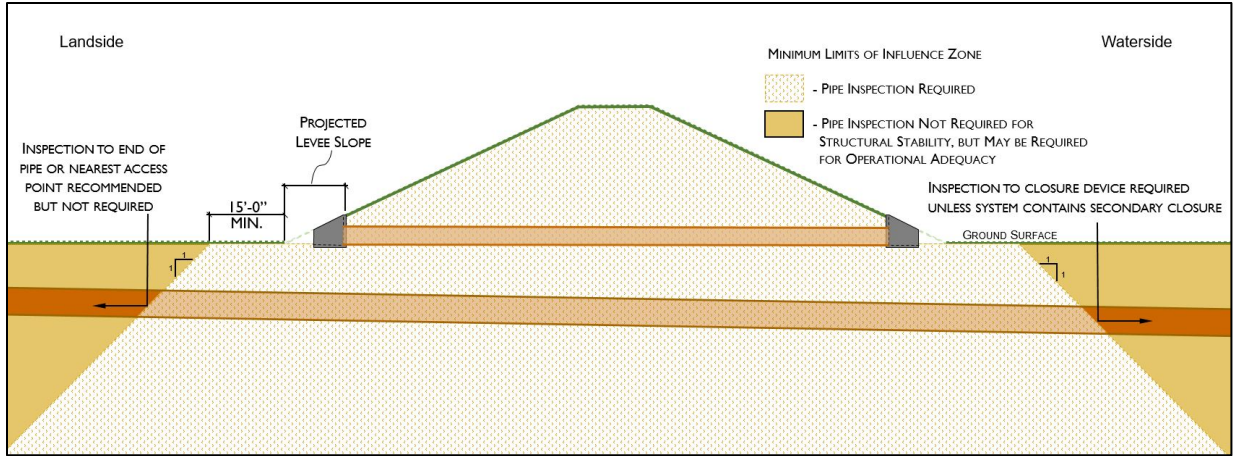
Gravity pipes through and beneath a levee embankment.
